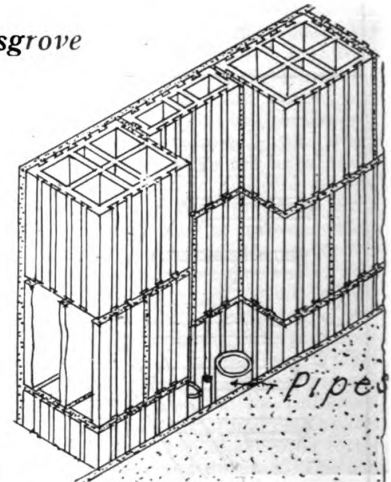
Pipe chase for plumbing and steam pipes. A plan view is shown in Fig. 55.
